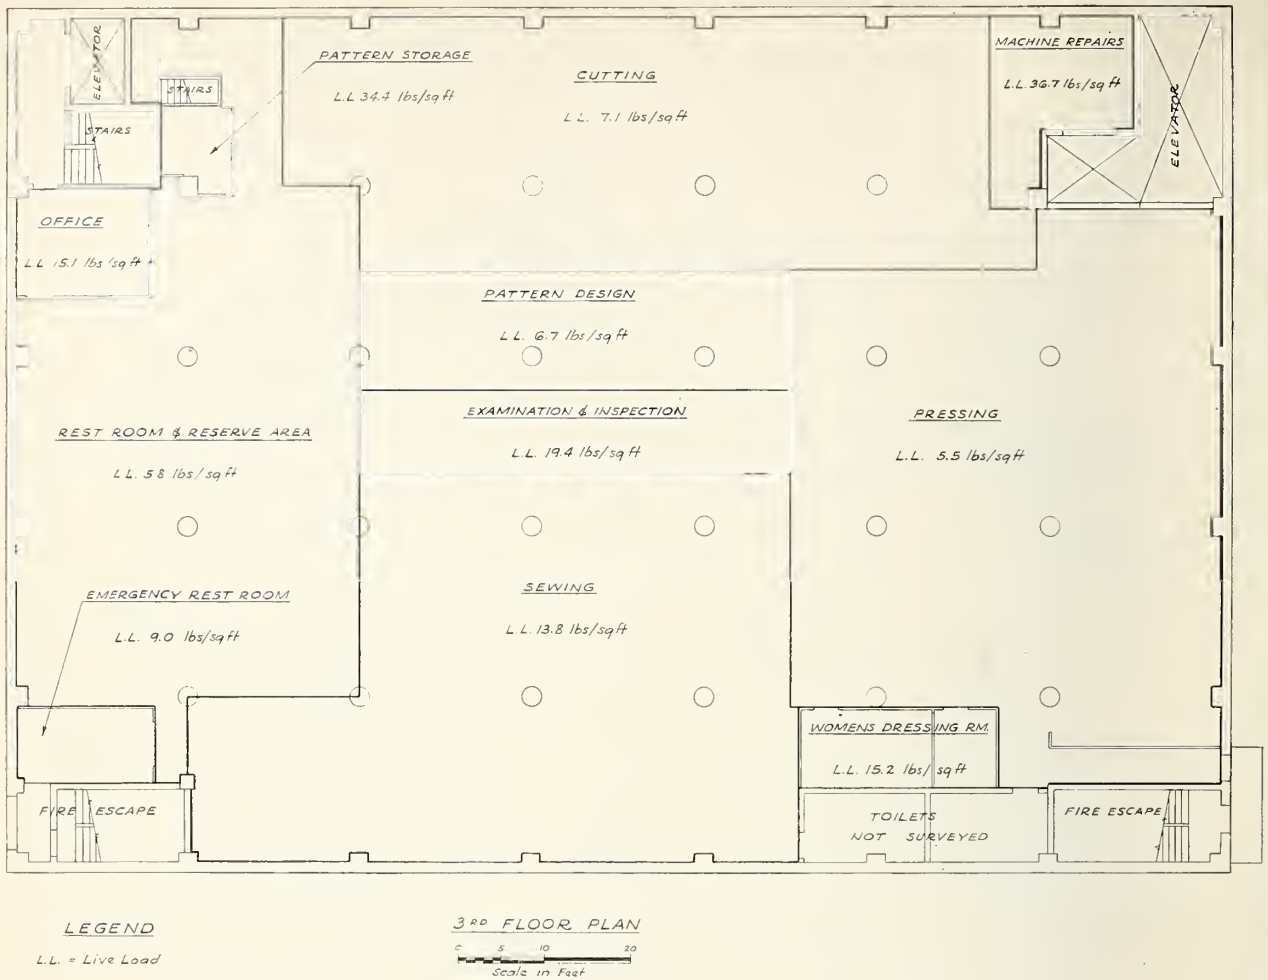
Third-floor plan, dress factory, Philadelphia, Pa.
